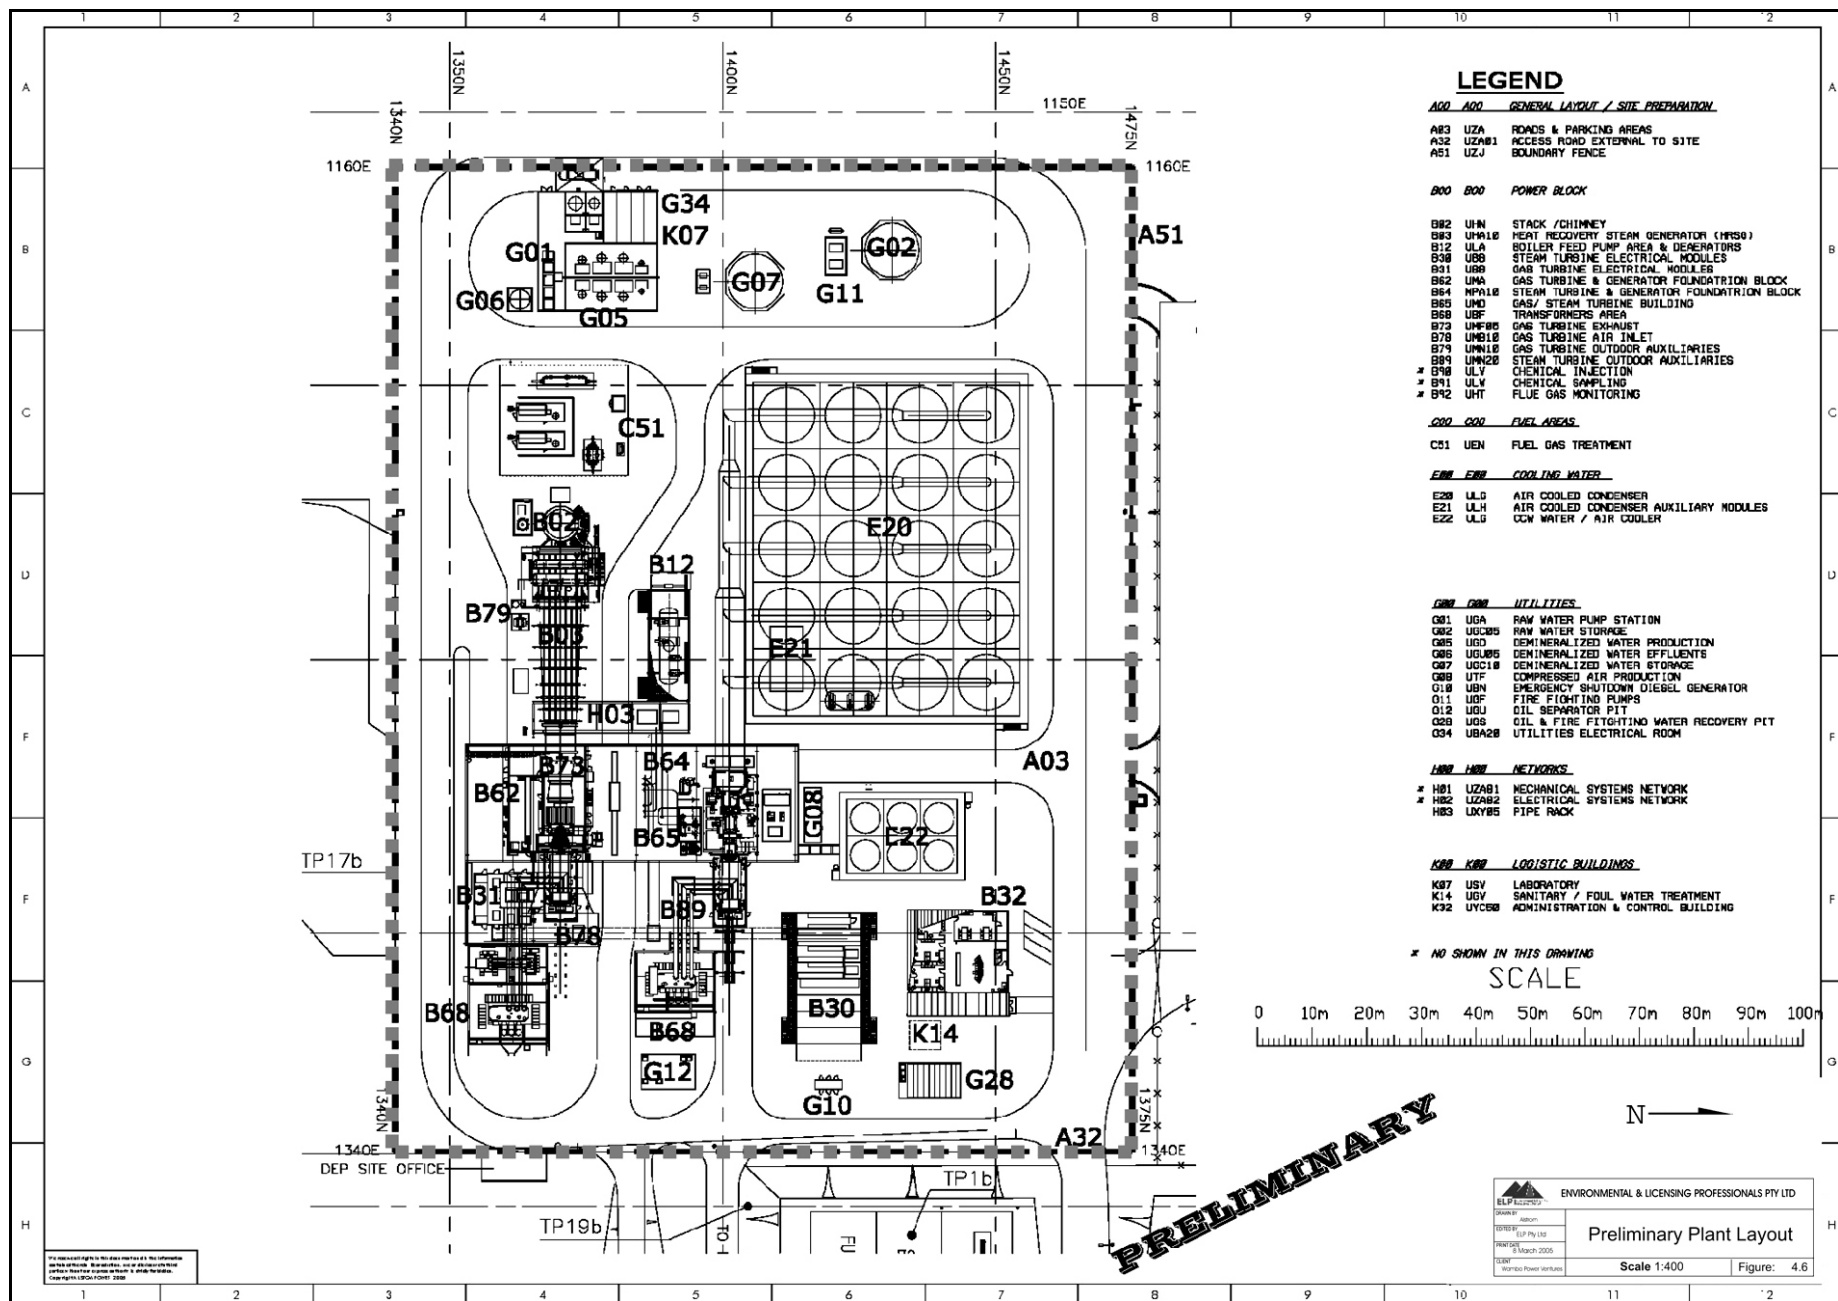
Proposed Kwinana Gas-Fired Power Station Site Layout
